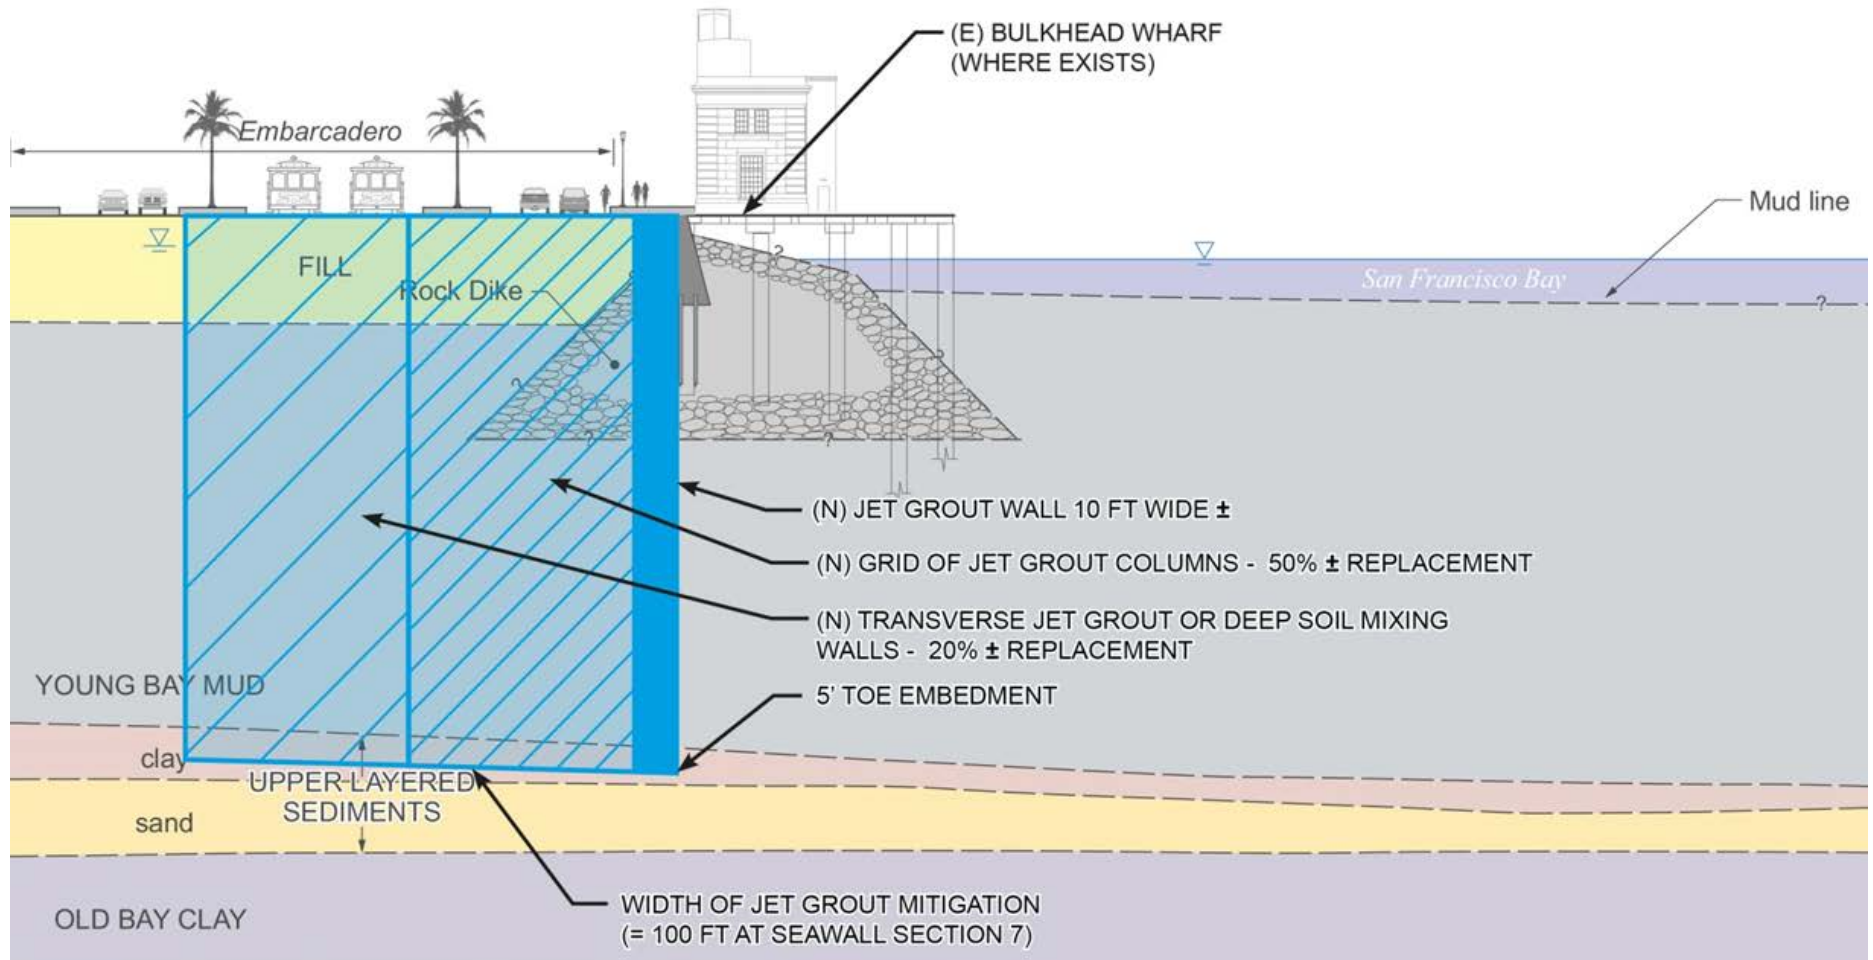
Soil Strengthening Alternative-Jet Grouting & Deep Soil Mixing Landside
